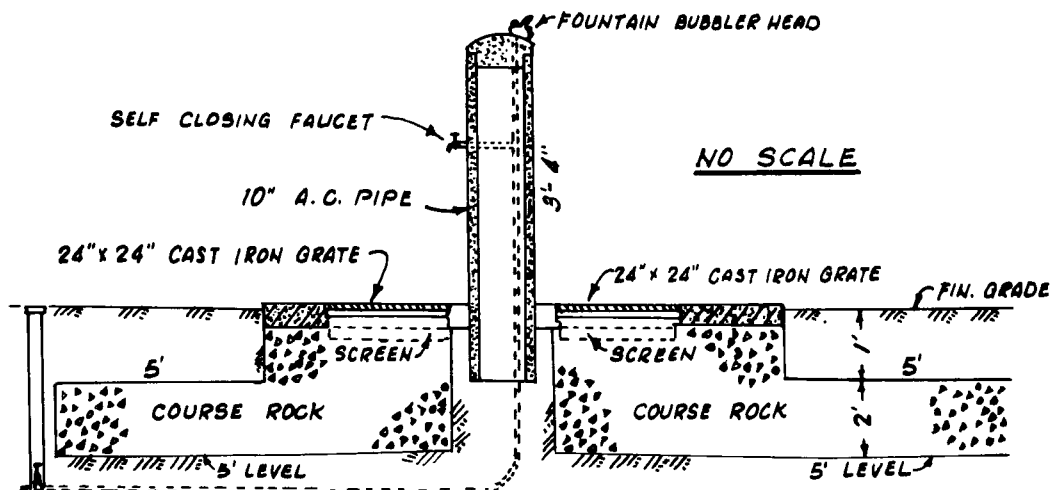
TYPICAL DRINKING FOUNTAIN AT PARK
